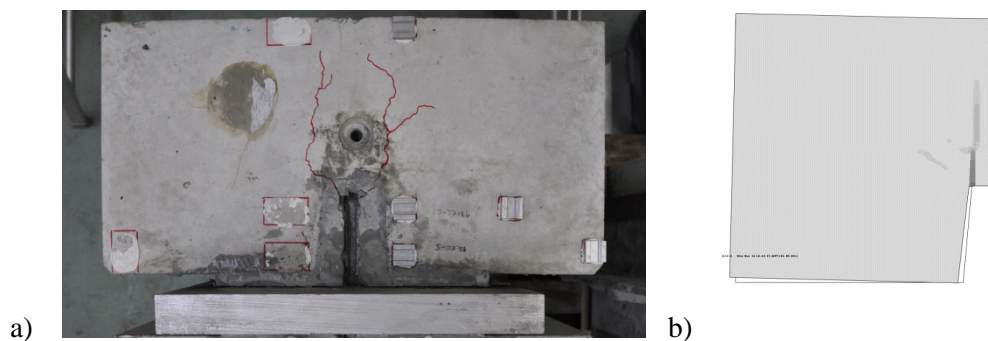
Cracking at failure a) Specimen PR100\_6 b) FEA
